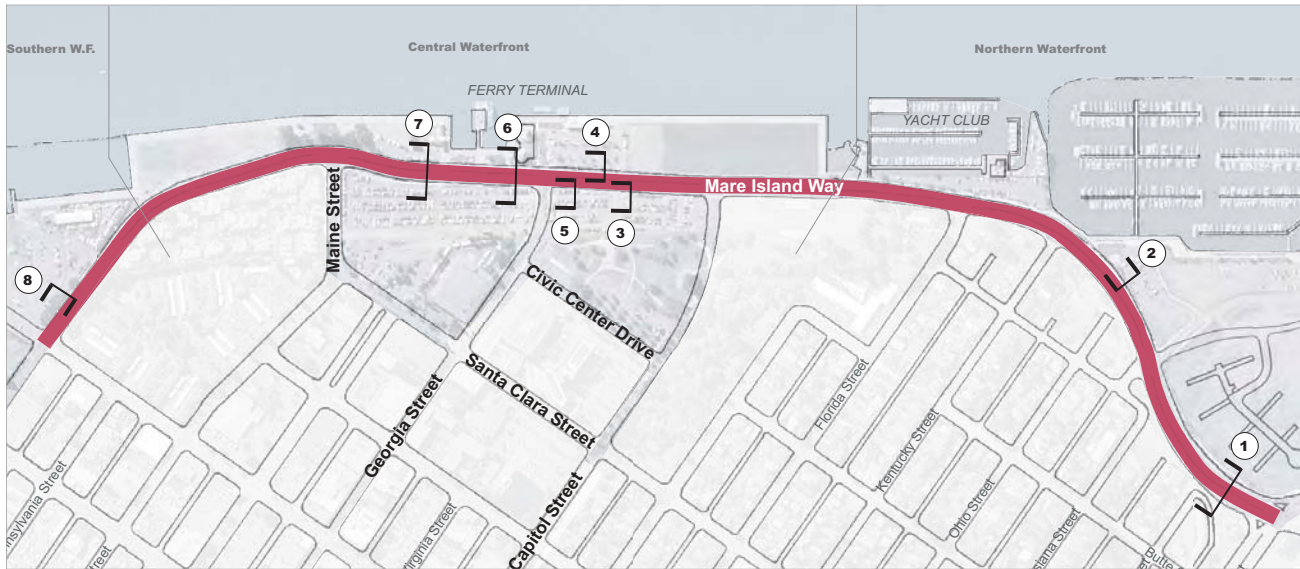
D.44: Mare Island Way and Section Location Diagram (For a description of section nos. 3 through 7, see Central Waterfront Section 2.2.1.G; For a description of section no.8, see Southern Waterfront Section 2.2.1.F.)
